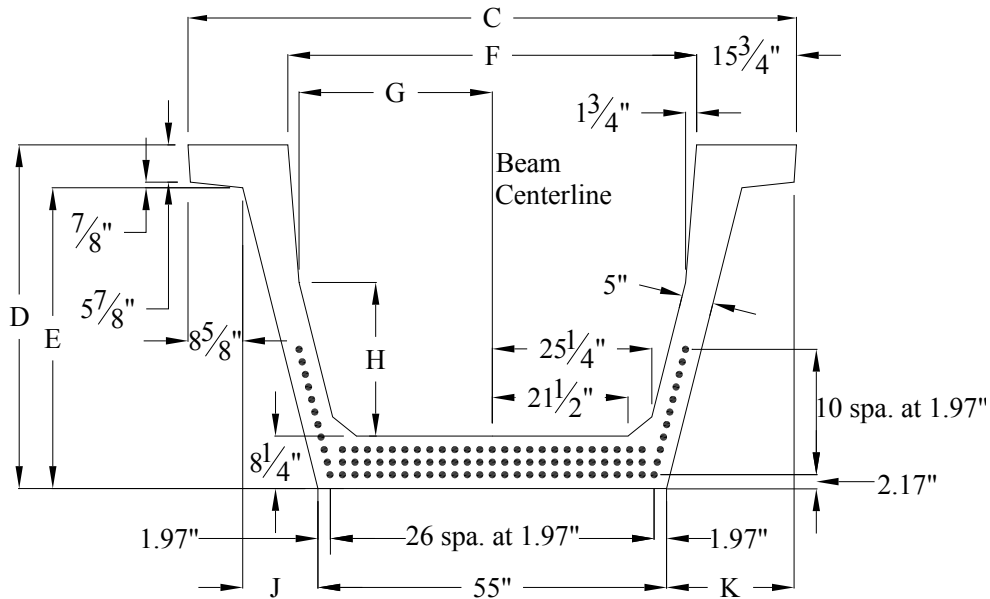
Typical Section and Strand Pattern of Texas U54 Girders (TxDOT 2001).
